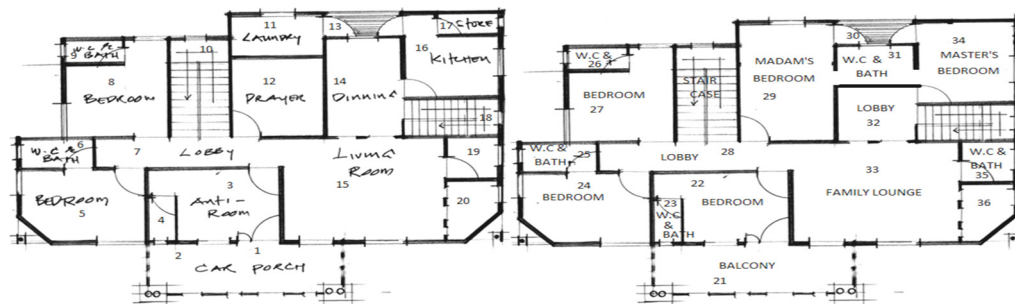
Plan of a Typical Bungalow (Source: Ekhaese 2011)
